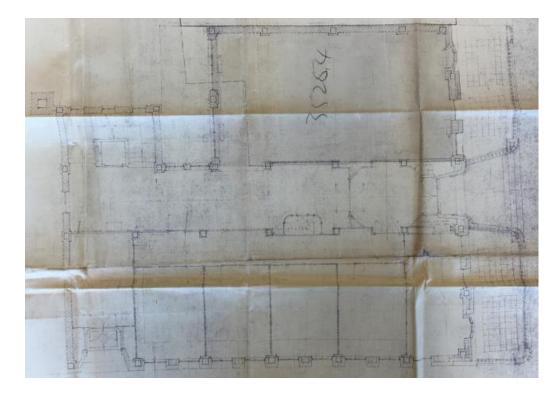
Ground Floor of Summit House dated 1932 (office element only) – indicating original and now mostly lost elements of the plan form of the main entrance lobby and hall (with reception), externally illuminated main staircase with well lift shaft, now infilled rear yard area, and external doorway to Dane Street with lobby
